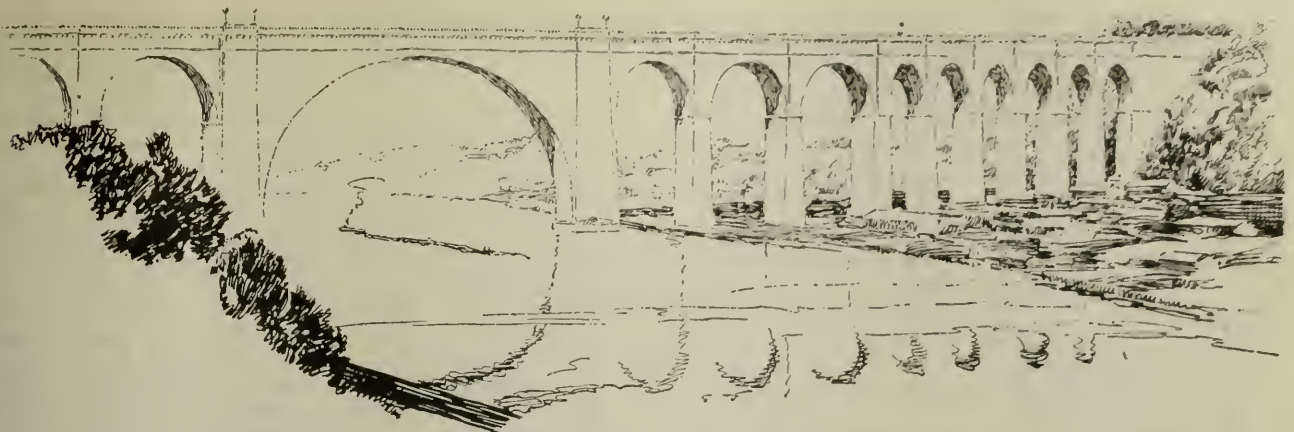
SKETCH VIEW OF HIGH BRIDGE WITH RECONSTRUCTED RIVER CROSSING AS PROPOSED BY WILGUS COMMITTEE
